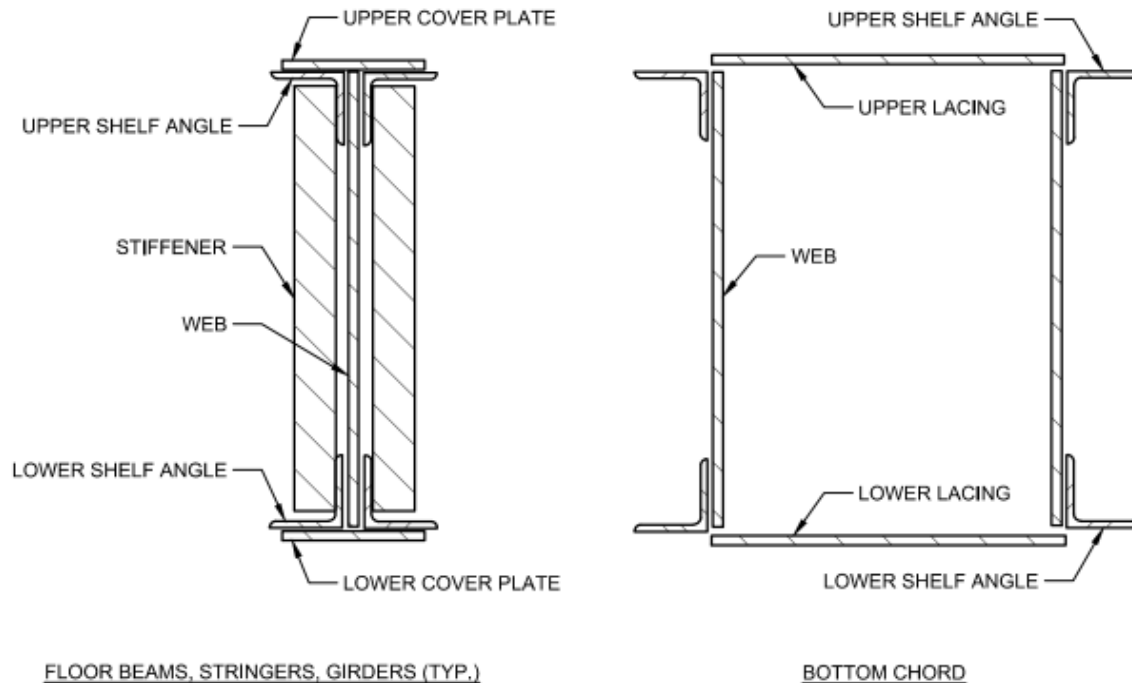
Cross Sections of Typical Built-Up Sections in Structure 104
